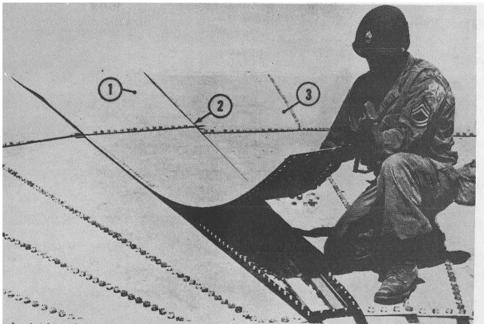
Lifting and supporting outer edge of installed bottom sections
